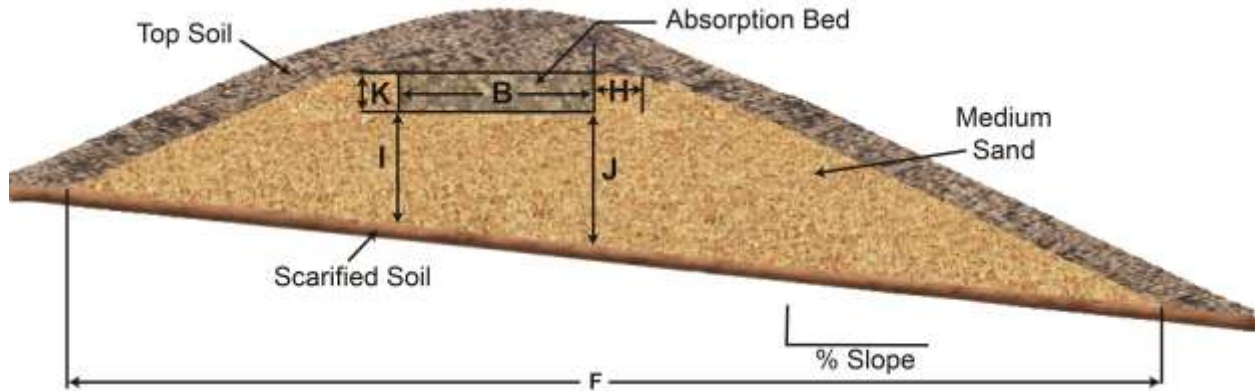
Design dimensions for use with the sand mound design checklist.
